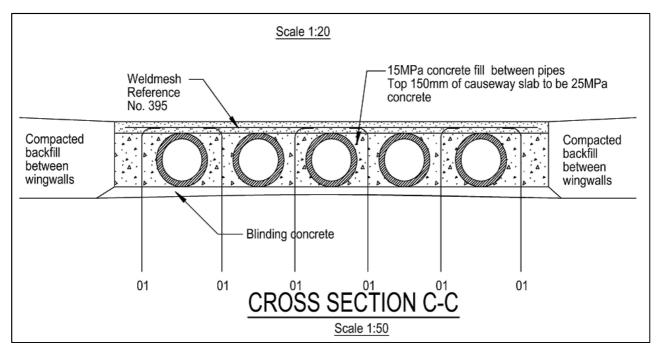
Design of proposed low-level bridge (causeway) use pipe culverts
